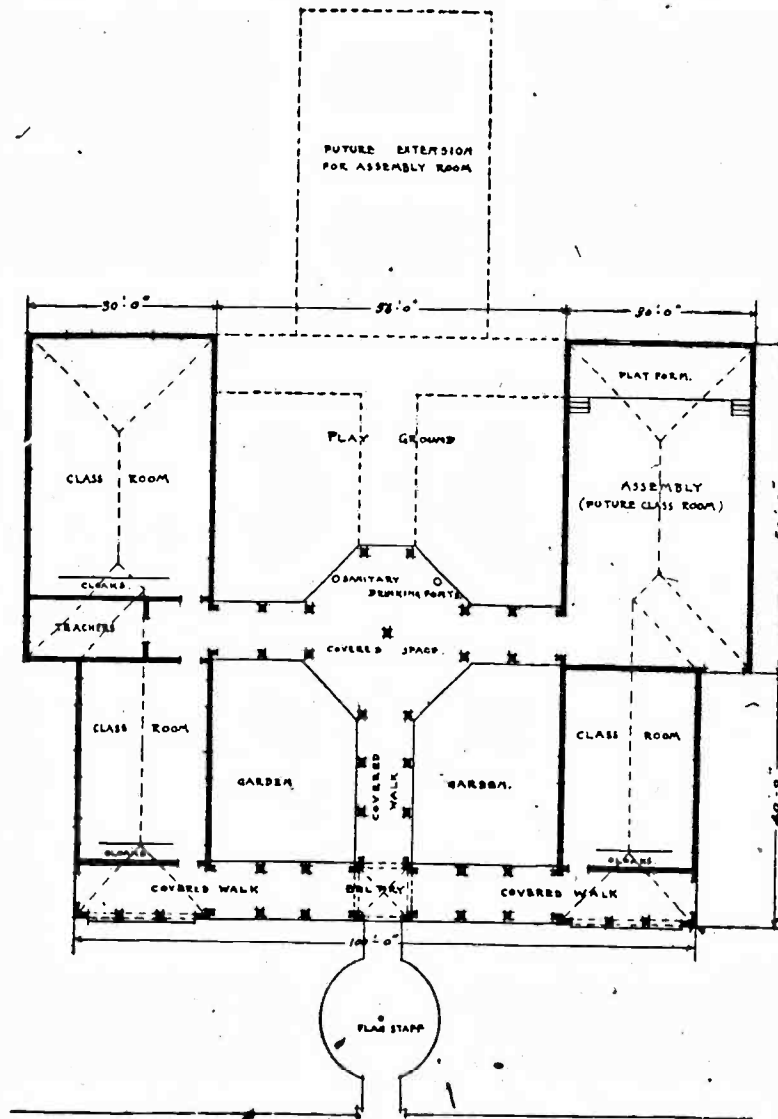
Floor plan, school at Coconut Grove, Fla.
